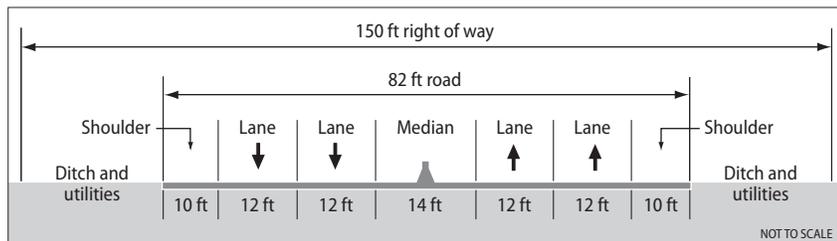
Typical right of way cross section of SR 502 under the Proposed Action
